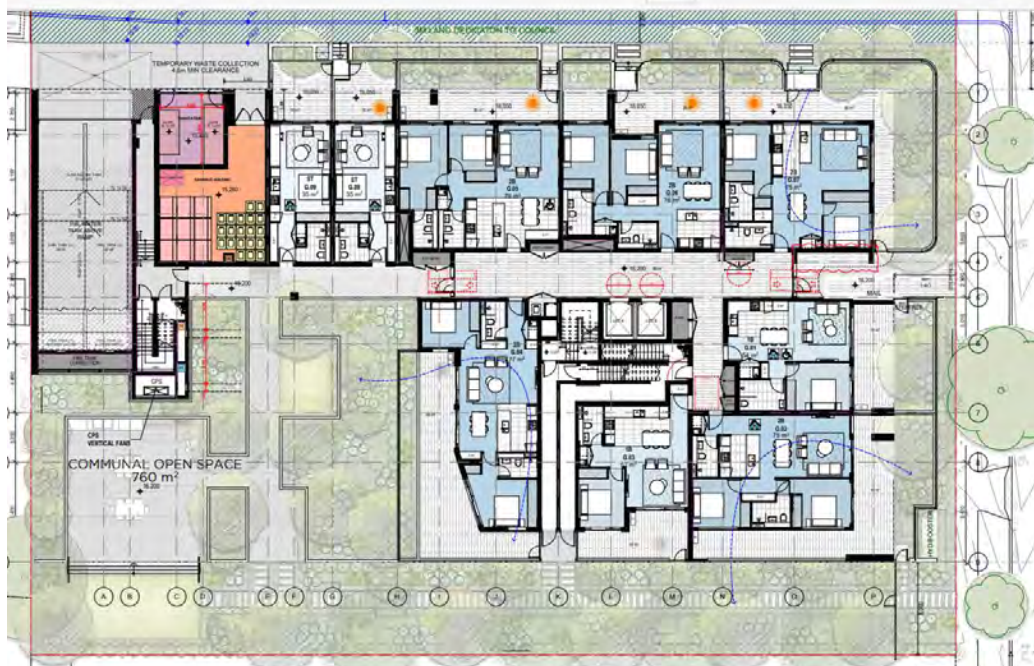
Proposed ground floor plan showing reduced COS area and provision of additional services, minor internal alterations and enclosure of pedestrian access adjoining driveway.
